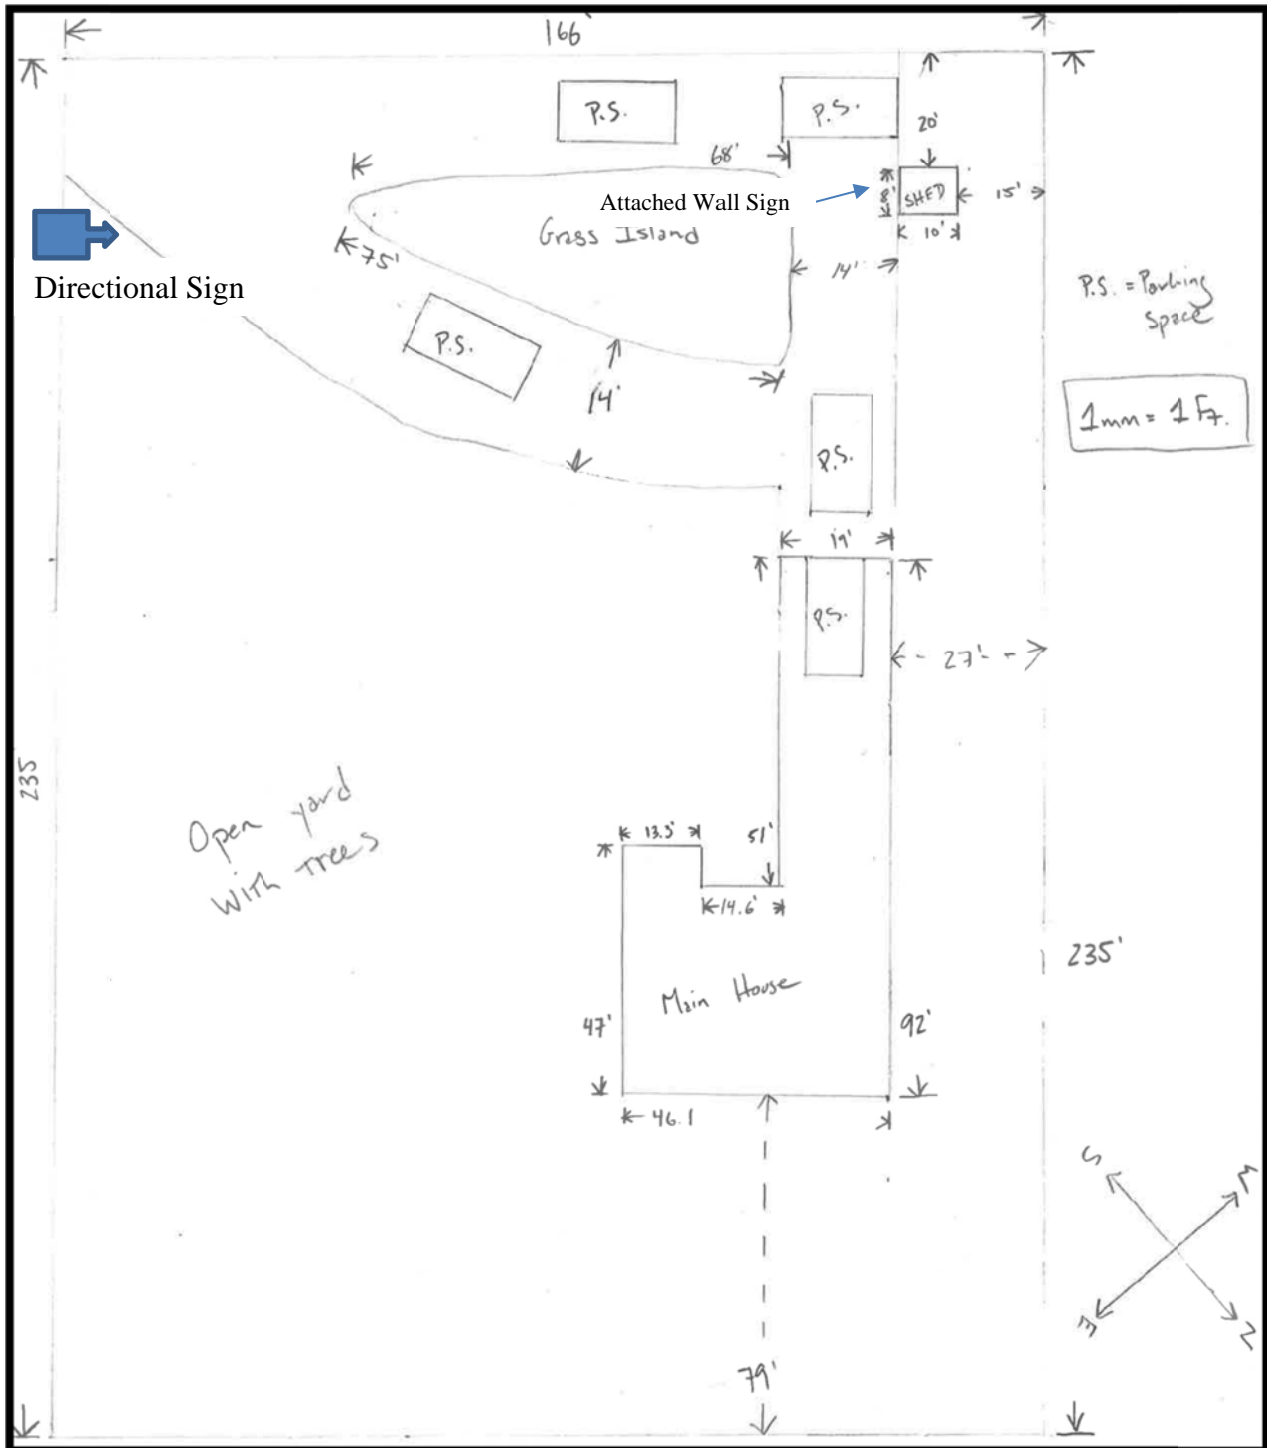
SITE PLAN FOR THE MONO LAKE HOUSE
